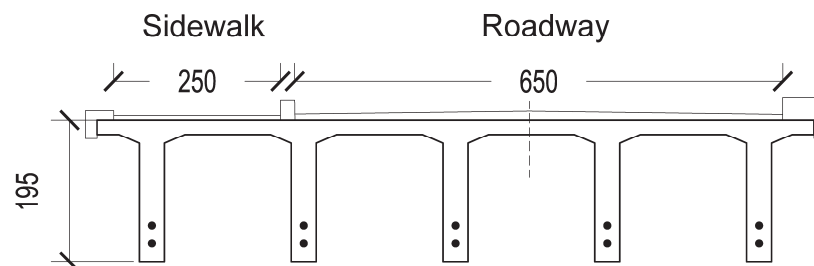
\_ Cross section of post-tensioned girders (all dimensions in cm), method 1
